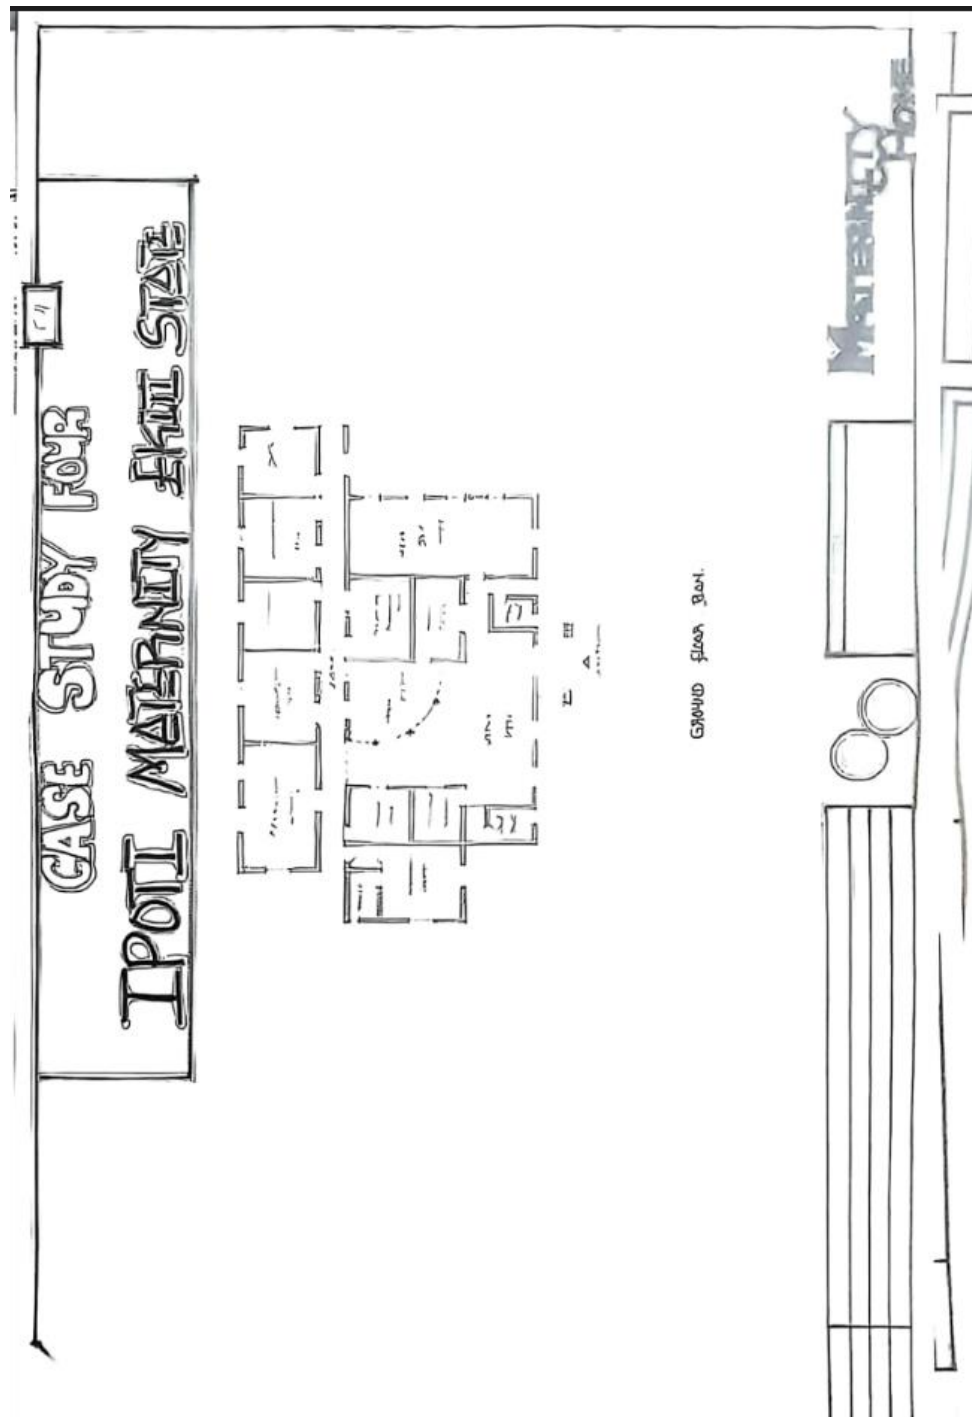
GROUND FLOOR PLAN OF CASE STUDY 4
